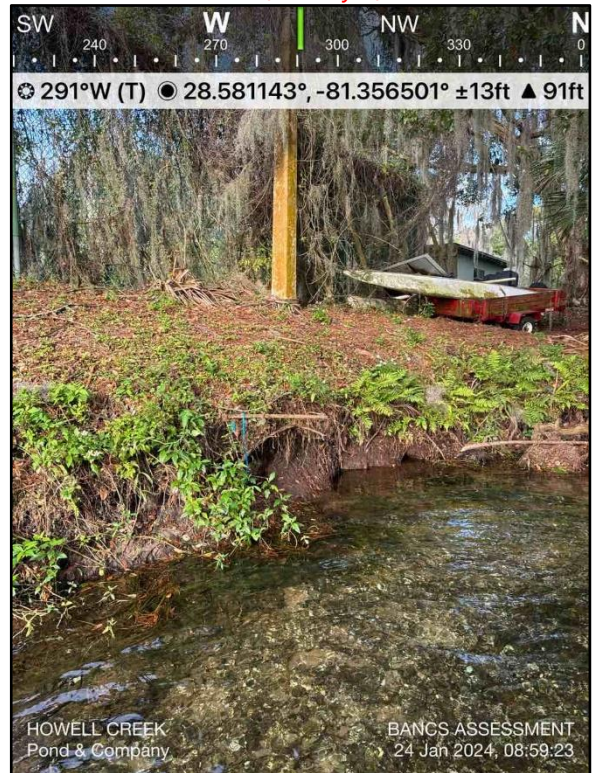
Structure 26; Wooden Retaining Wall (Priority 4)
